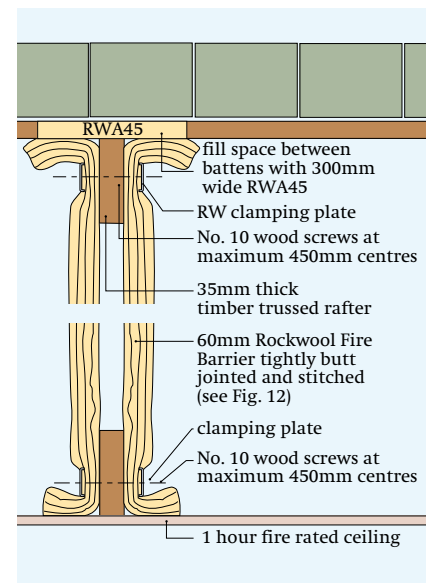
One hour protection for timber truss construction between 35 - 49mm thick
